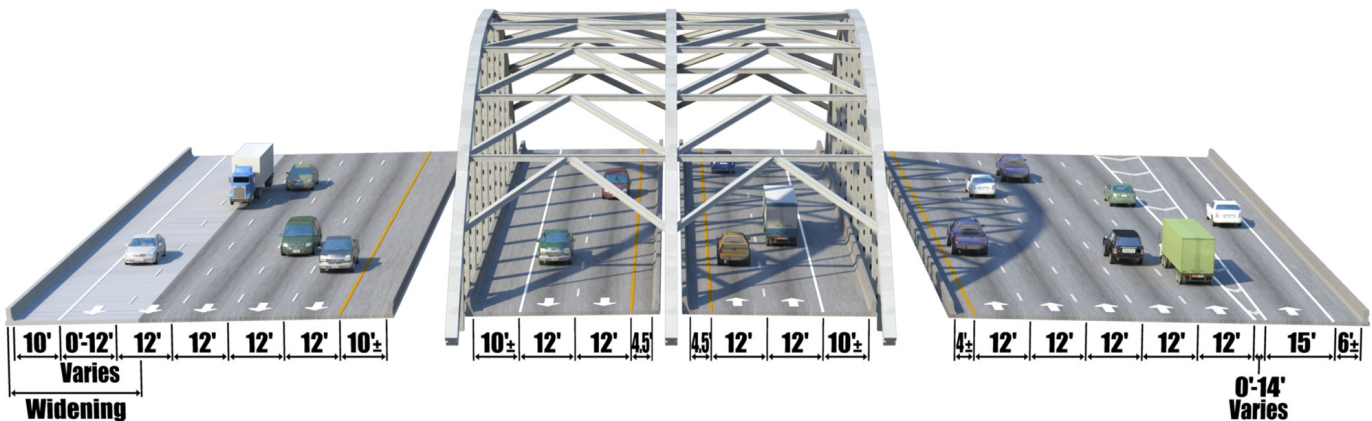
Proposed Typical Section at the Myrtle Ave Overpass, looking north
